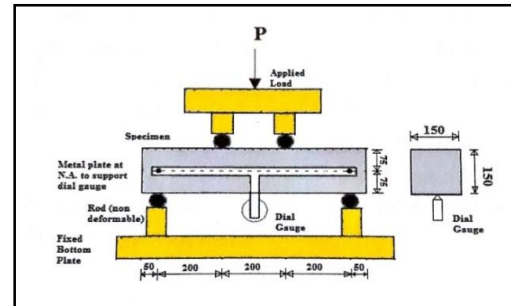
Two-point loading setup in flexural test (All dimensions are in mm)
